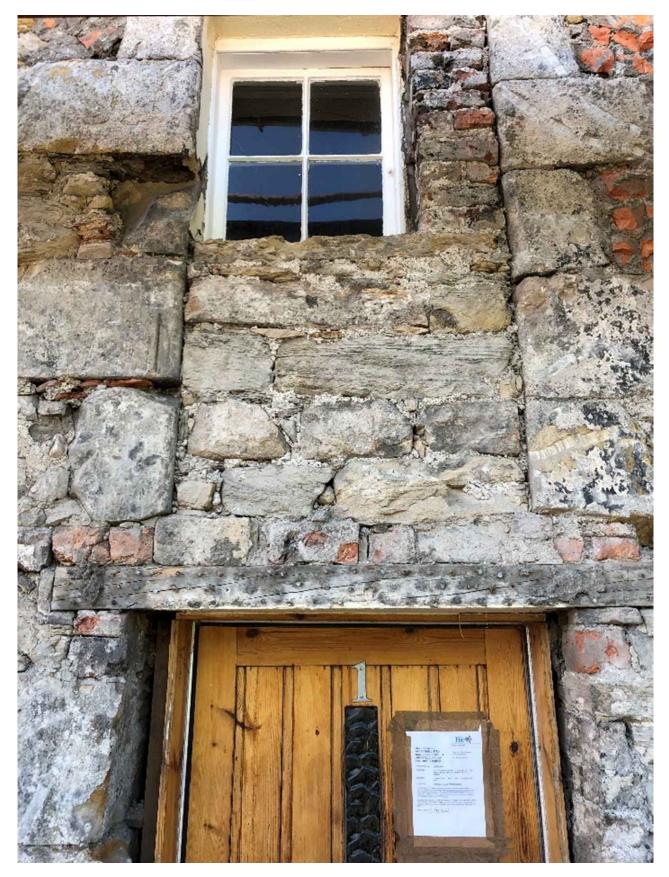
Quoined returns at the front door that show the building was once two distinct buildings. The quoins run down to grade
